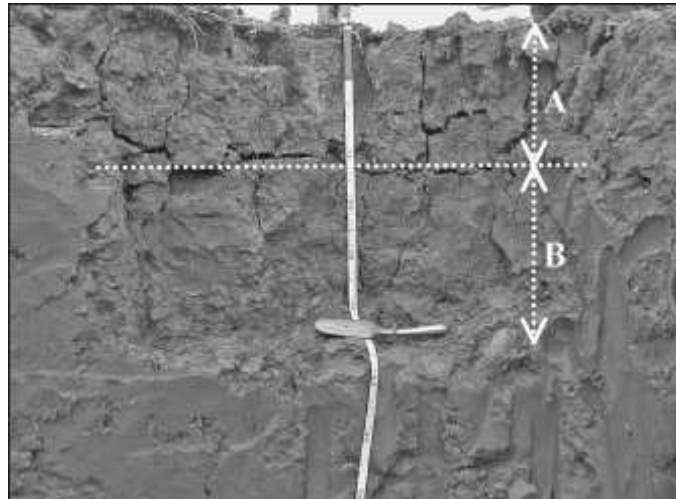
Trench dug in slopes showing vertical and subhorizontal cracks (after Dyer et al., 2009)
